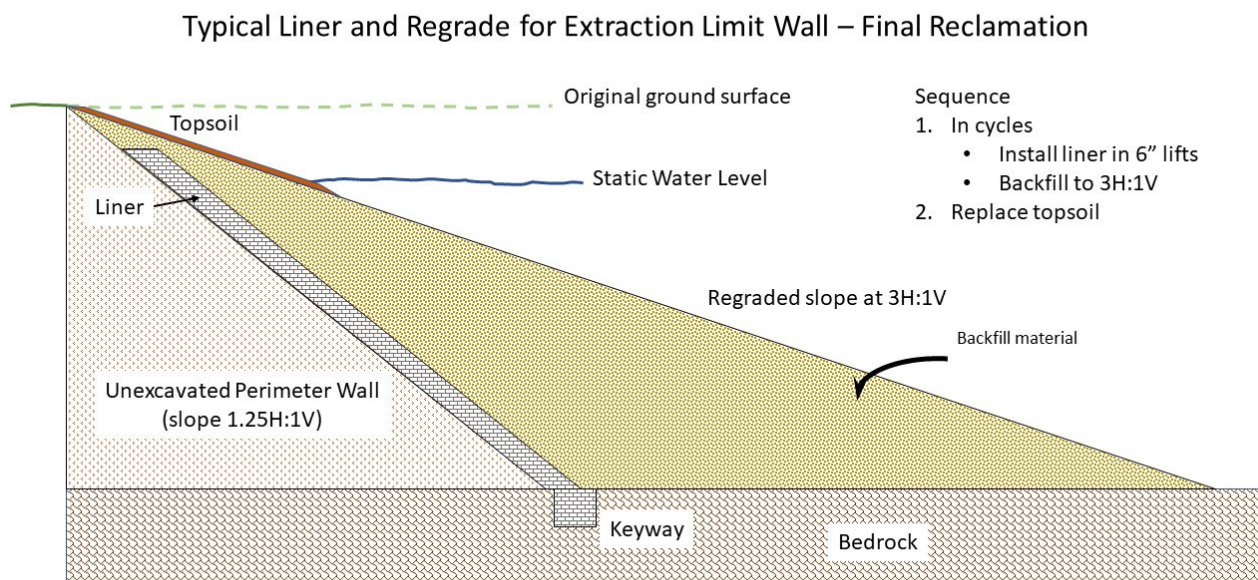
Typical Liner and Regrade for Extraction Limit Wall
